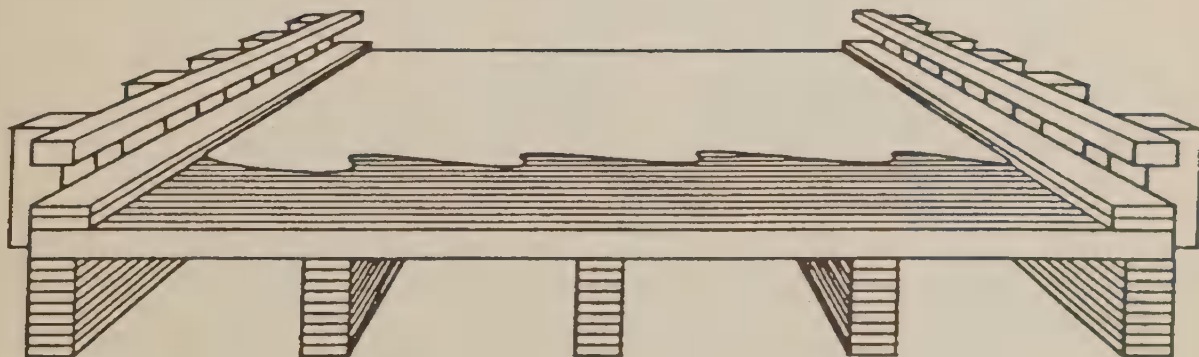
A Modern Timber Bridge With a Glulam Transverse Deck and Glulam Stringers
